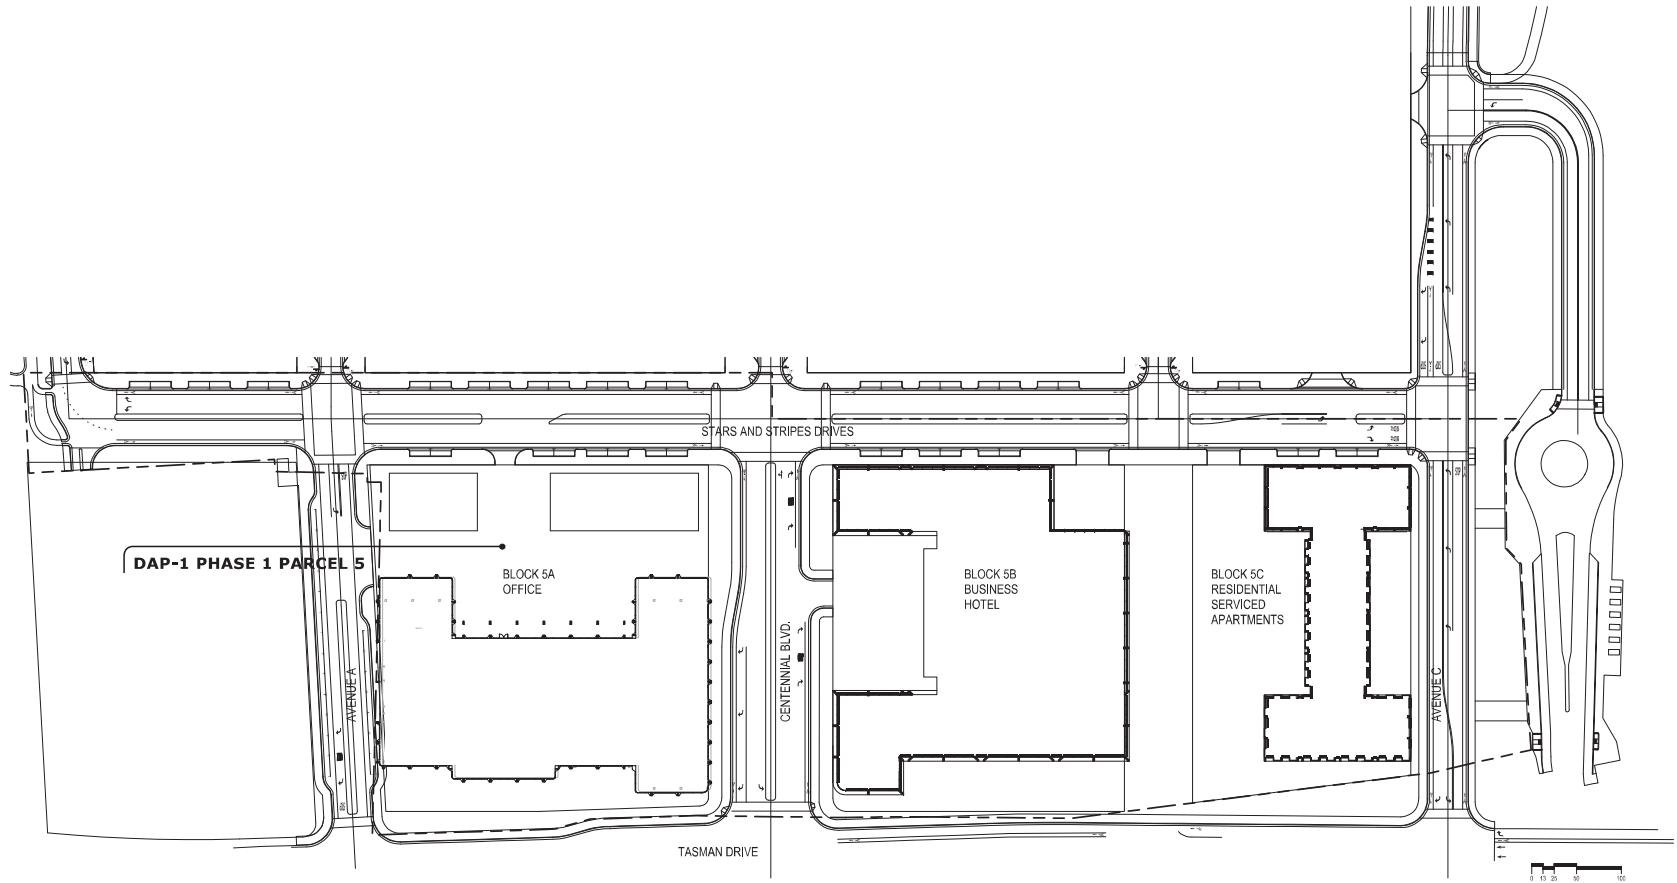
SITE PLAN. LOCATION OF POTENTIAL USES
